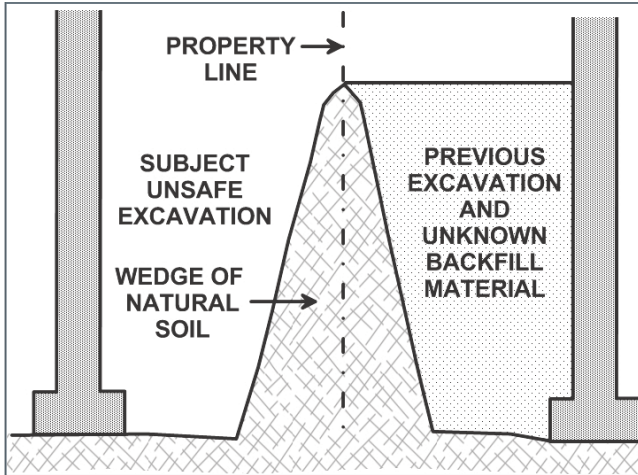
Example of a potentially unstable slope configuration that can occur when an excavation is advanced adjacent to a previous excavation with unknown backfill material, leaving a wedge of natural soil.
